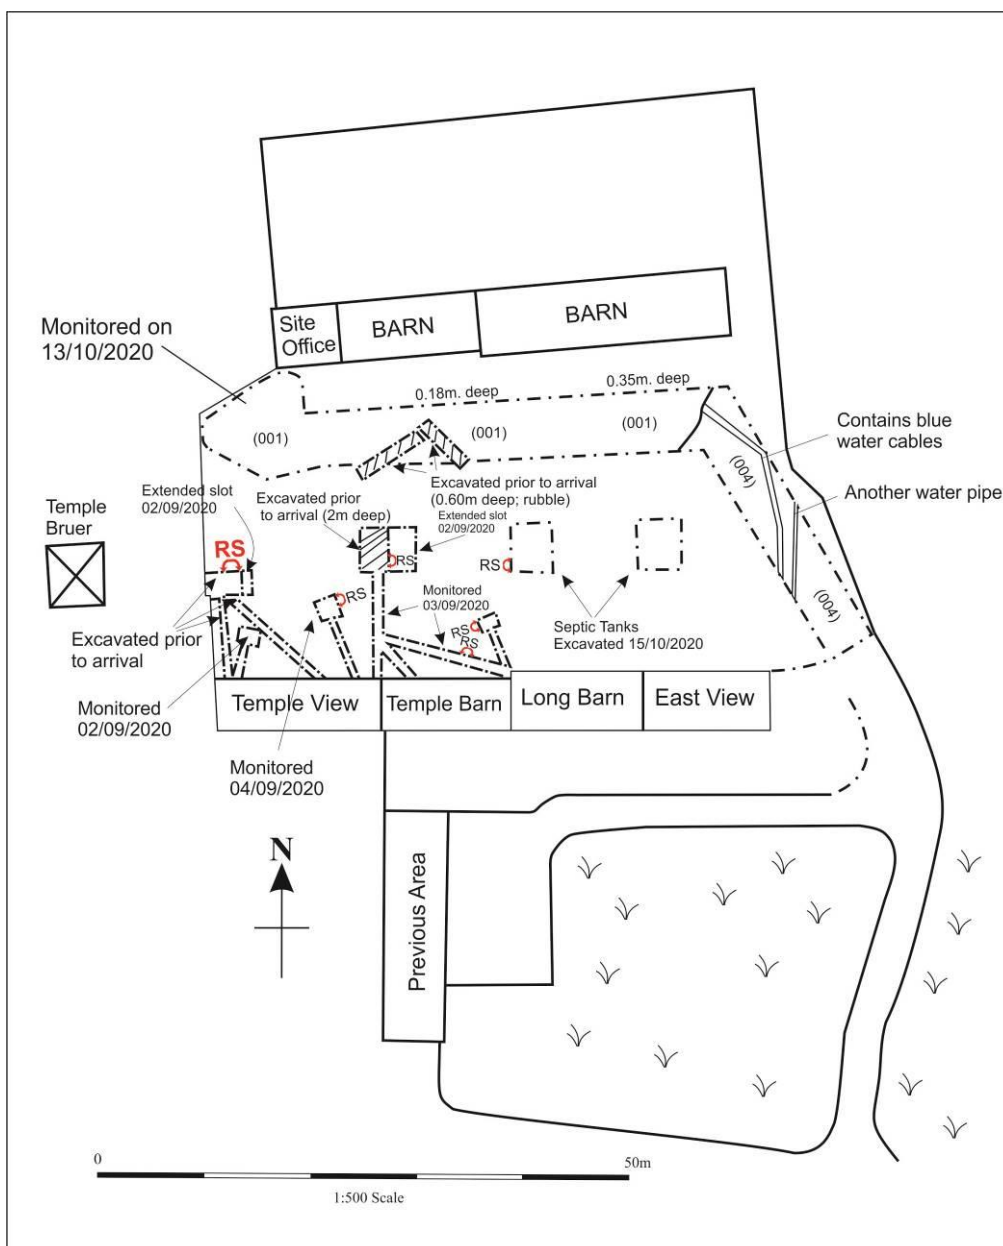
General excavation plan at scale 1:500. Not reproduced to scale (70%).
